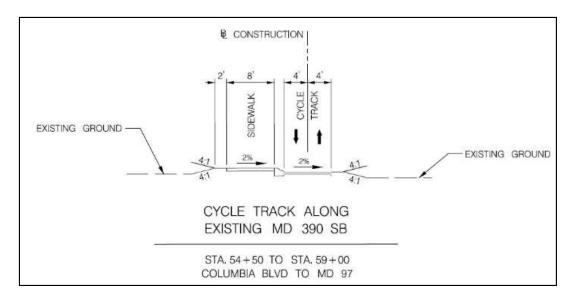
Proposed Cross Section – 16th Street Separated Bike Lanes
